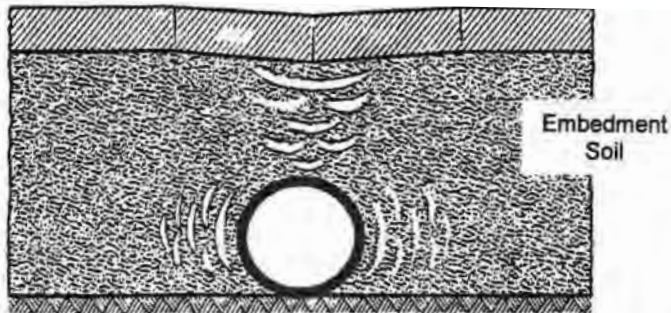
Pavement Failure Due to Inadequate Embedment Soil Compaction or Low-Quality Embedment Soil Adjacent to Flexible Pipe
